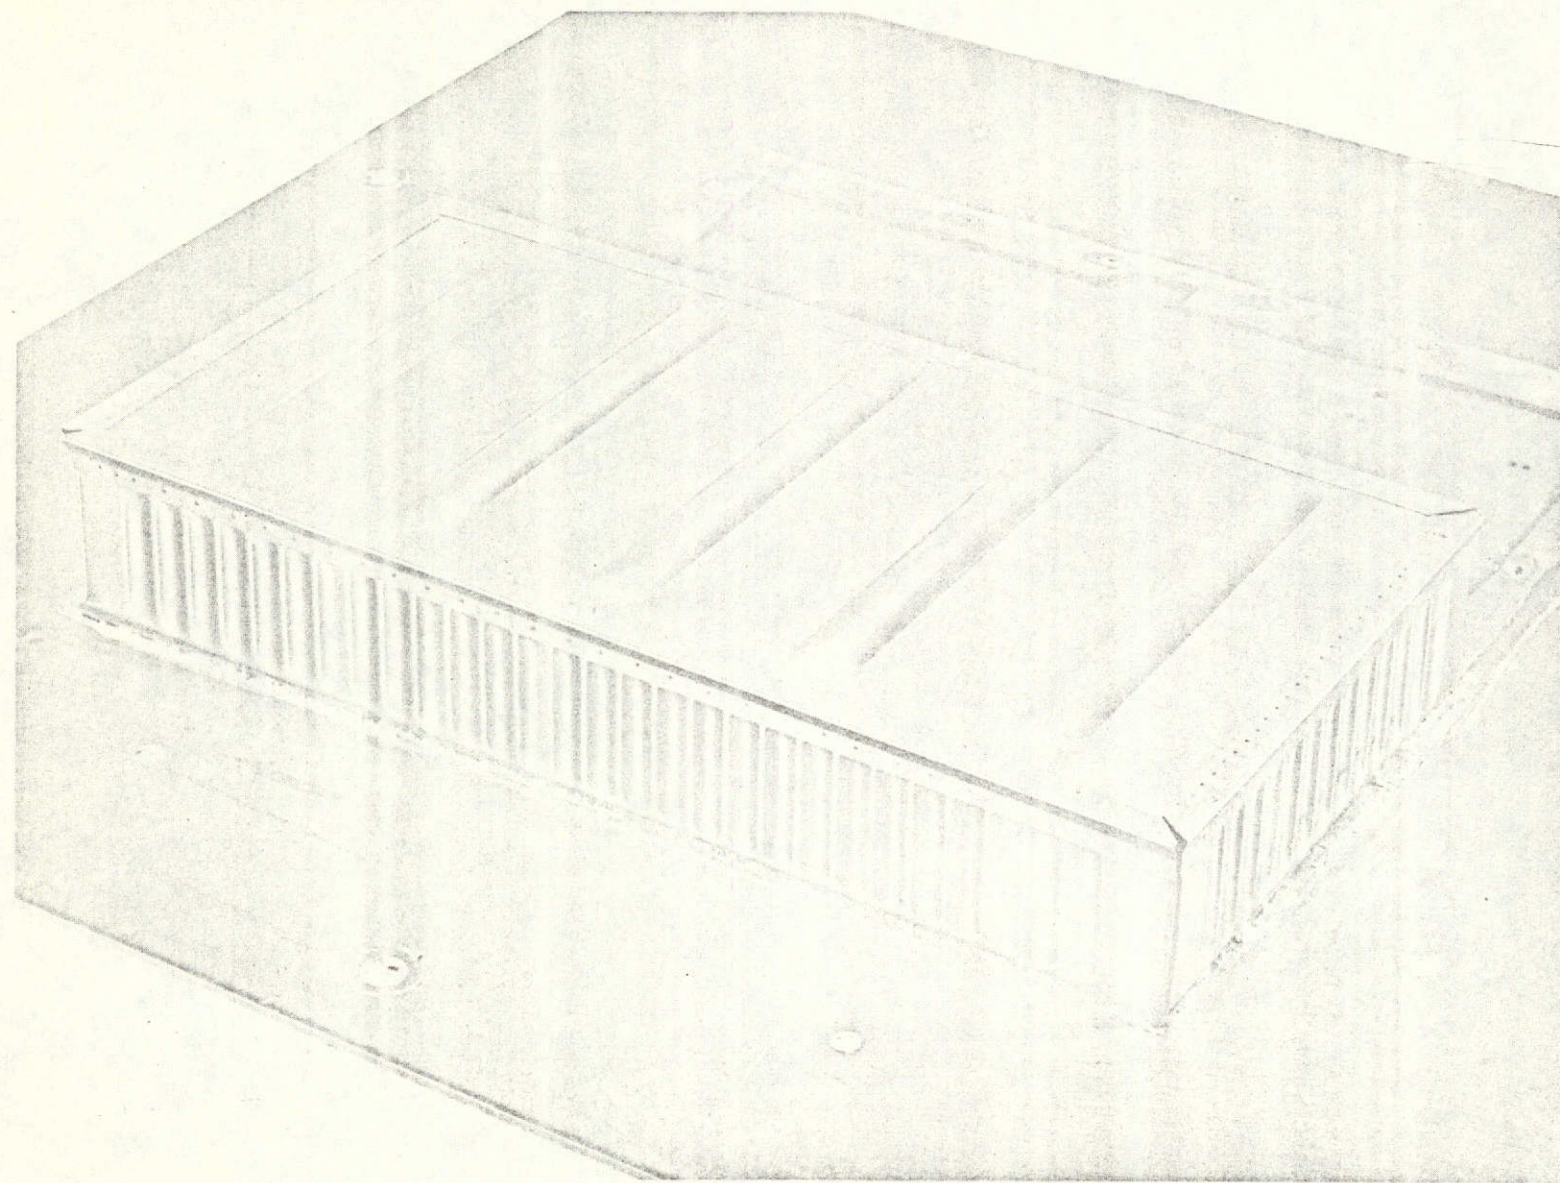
TENSION-TOP SPECIMEN (SPECIMEN 13)
